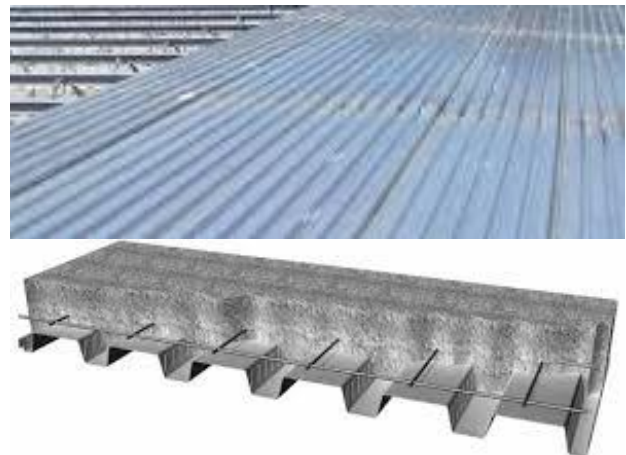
Steel deck diaphragms (top) roof - bare deck on open web steel joists (ASC, 2018), (bottom) floor - concrete filled deck (ASC, 2018)
